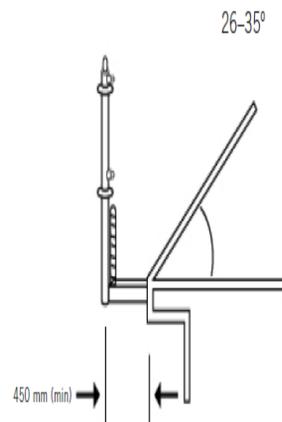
Roofs with pitch between 25 and 35 degrees require a two-plank platform guardrail system (end guardrail omitted for clarity)
